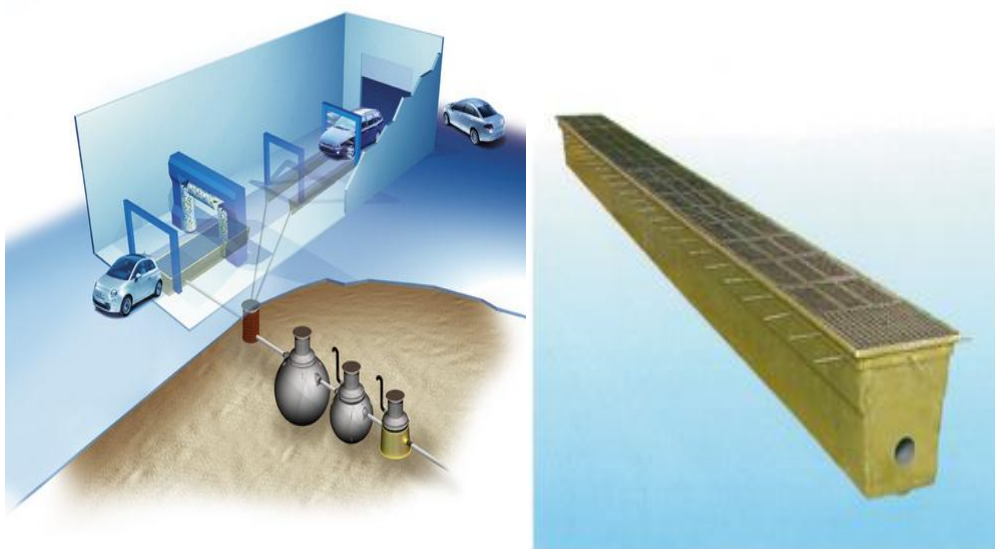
Treatment system in the car wash center and silt trap drainage channel (Wavin-Labko Ltd, 2011)
